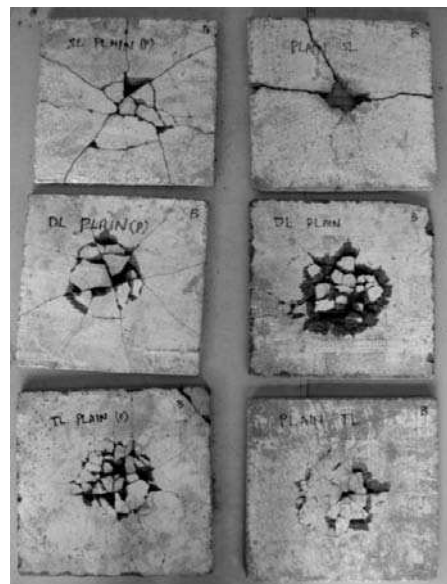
Crack Pattern on Ferrocement Slabs (Bottom Face) with 'P' and 'G' Meshes (1,2,3 Layers from Left Top to Bottom) at Ultimate Specimen Failure Stage
